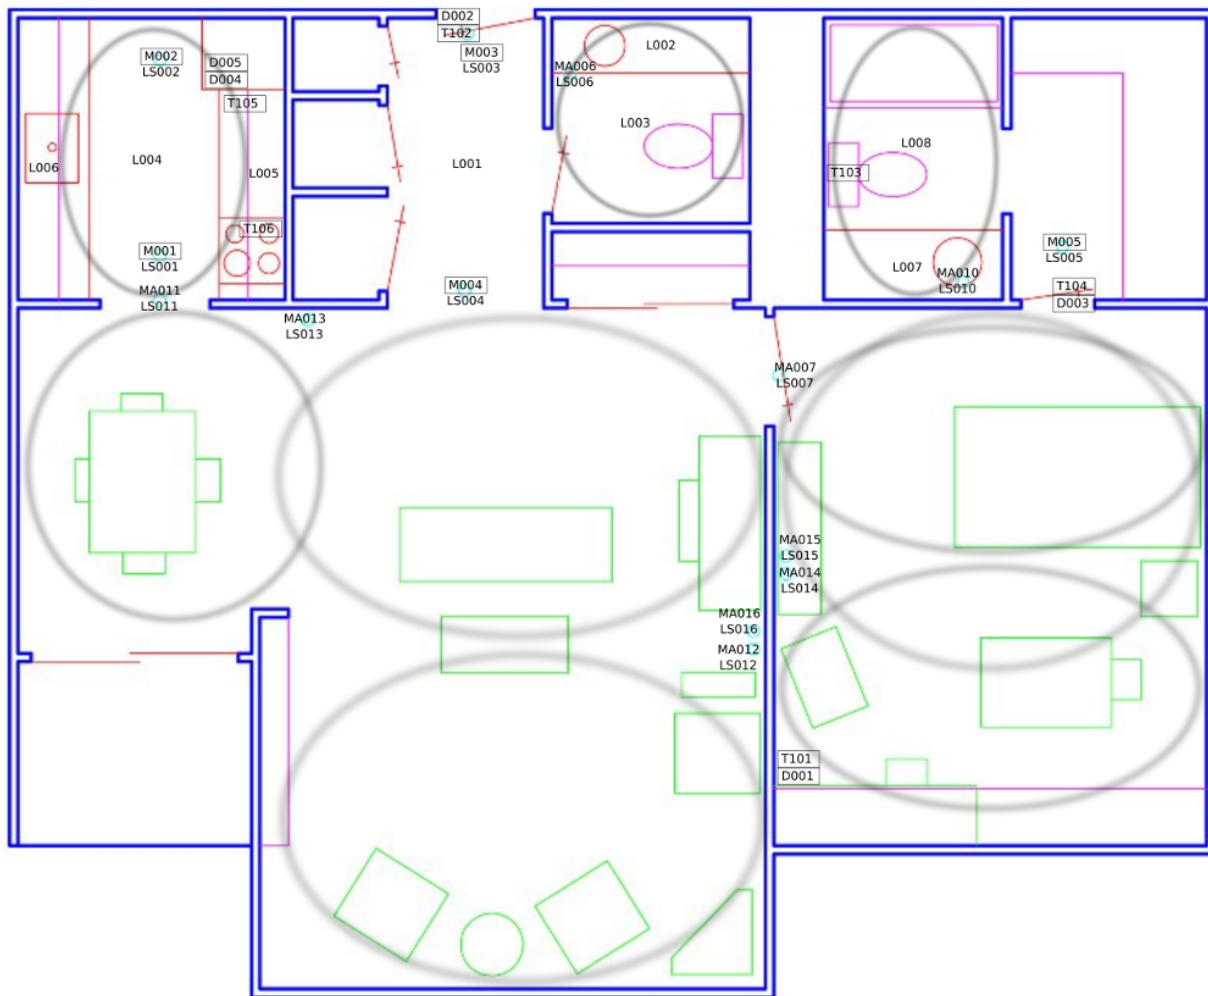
Floor plan and sensor placement for the testbed hh116.
